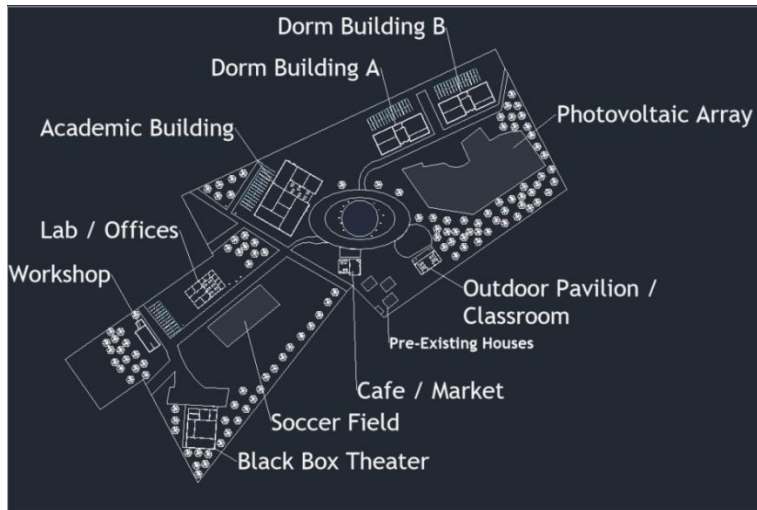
Final (labeled) full site plan for the college of architecture, art, and sustainability.
